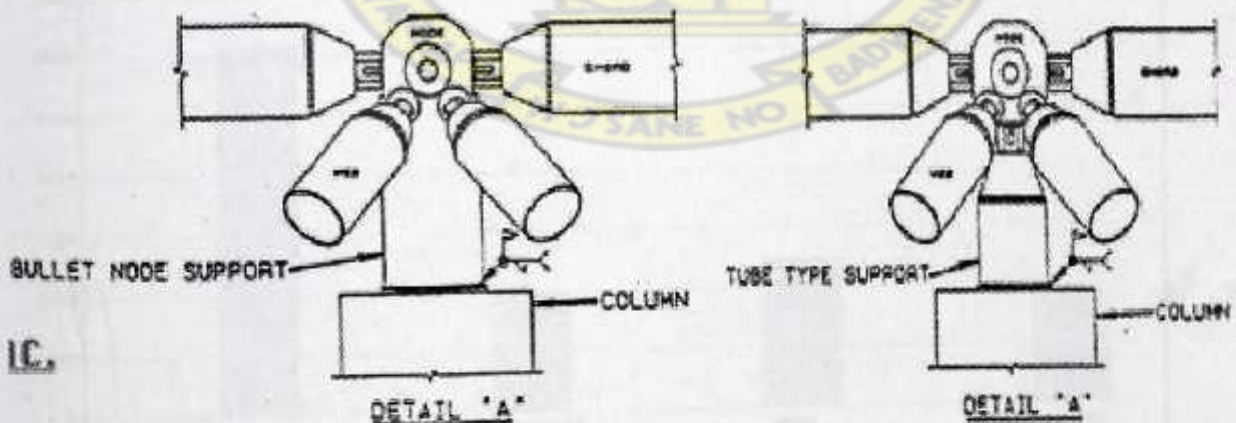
connection of spaceframe members (source: Delta structures Inc.-Guide specifications)
